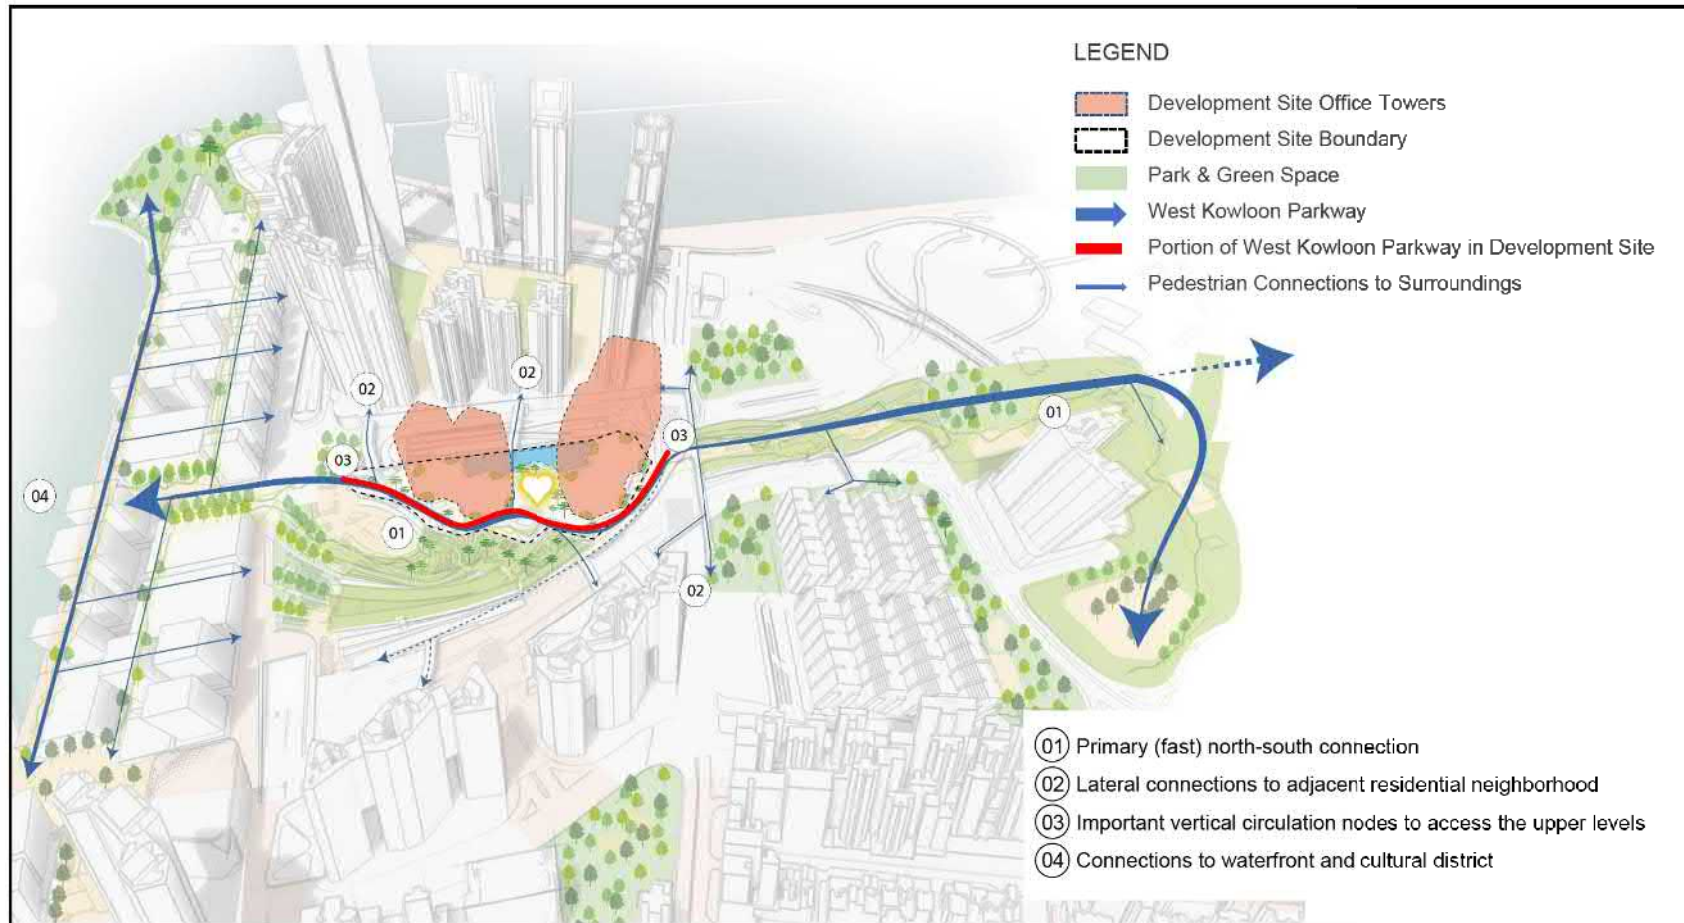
Pedestrian Connectivity of West Kowloon Parkway through Application Site
